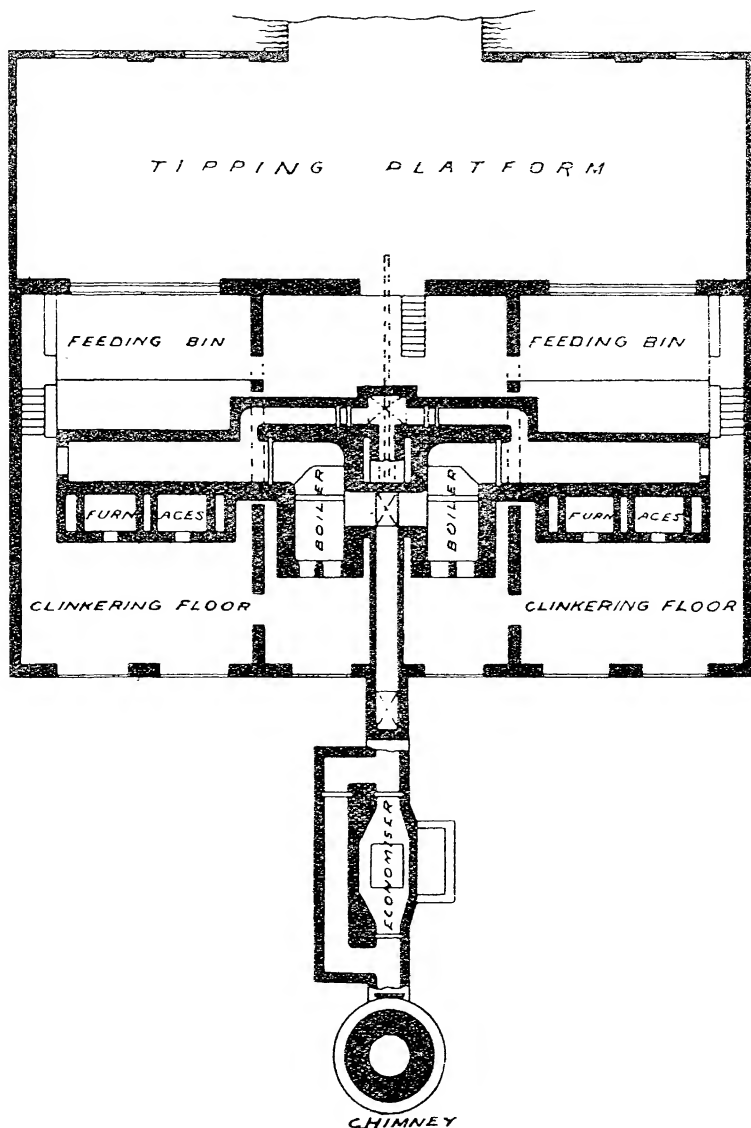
Horsfall's Back-fed Destructor at Dunoon. Plan.
